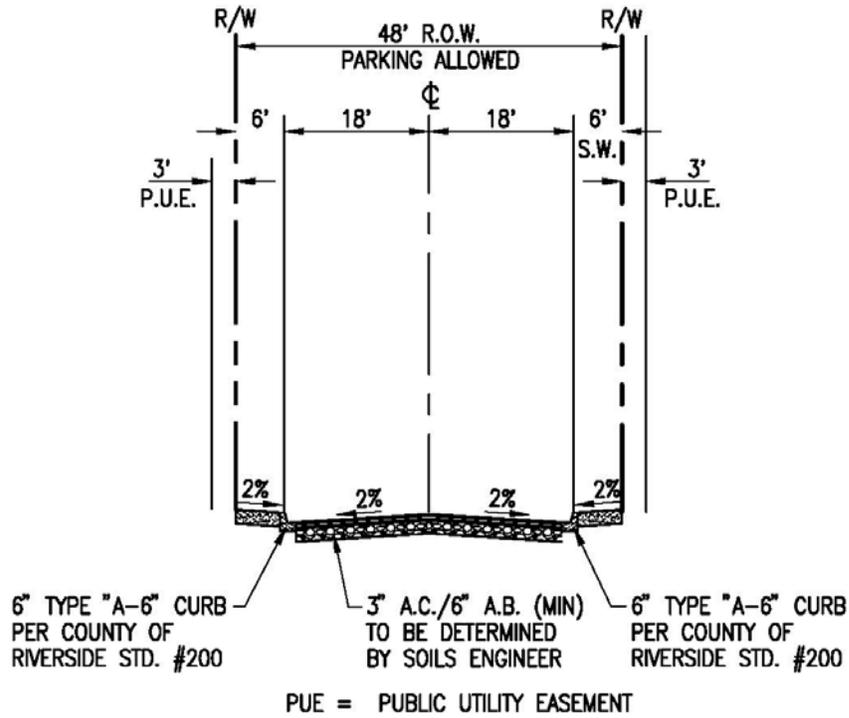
Summerly Modified Neighborhood Street Cross-Section
